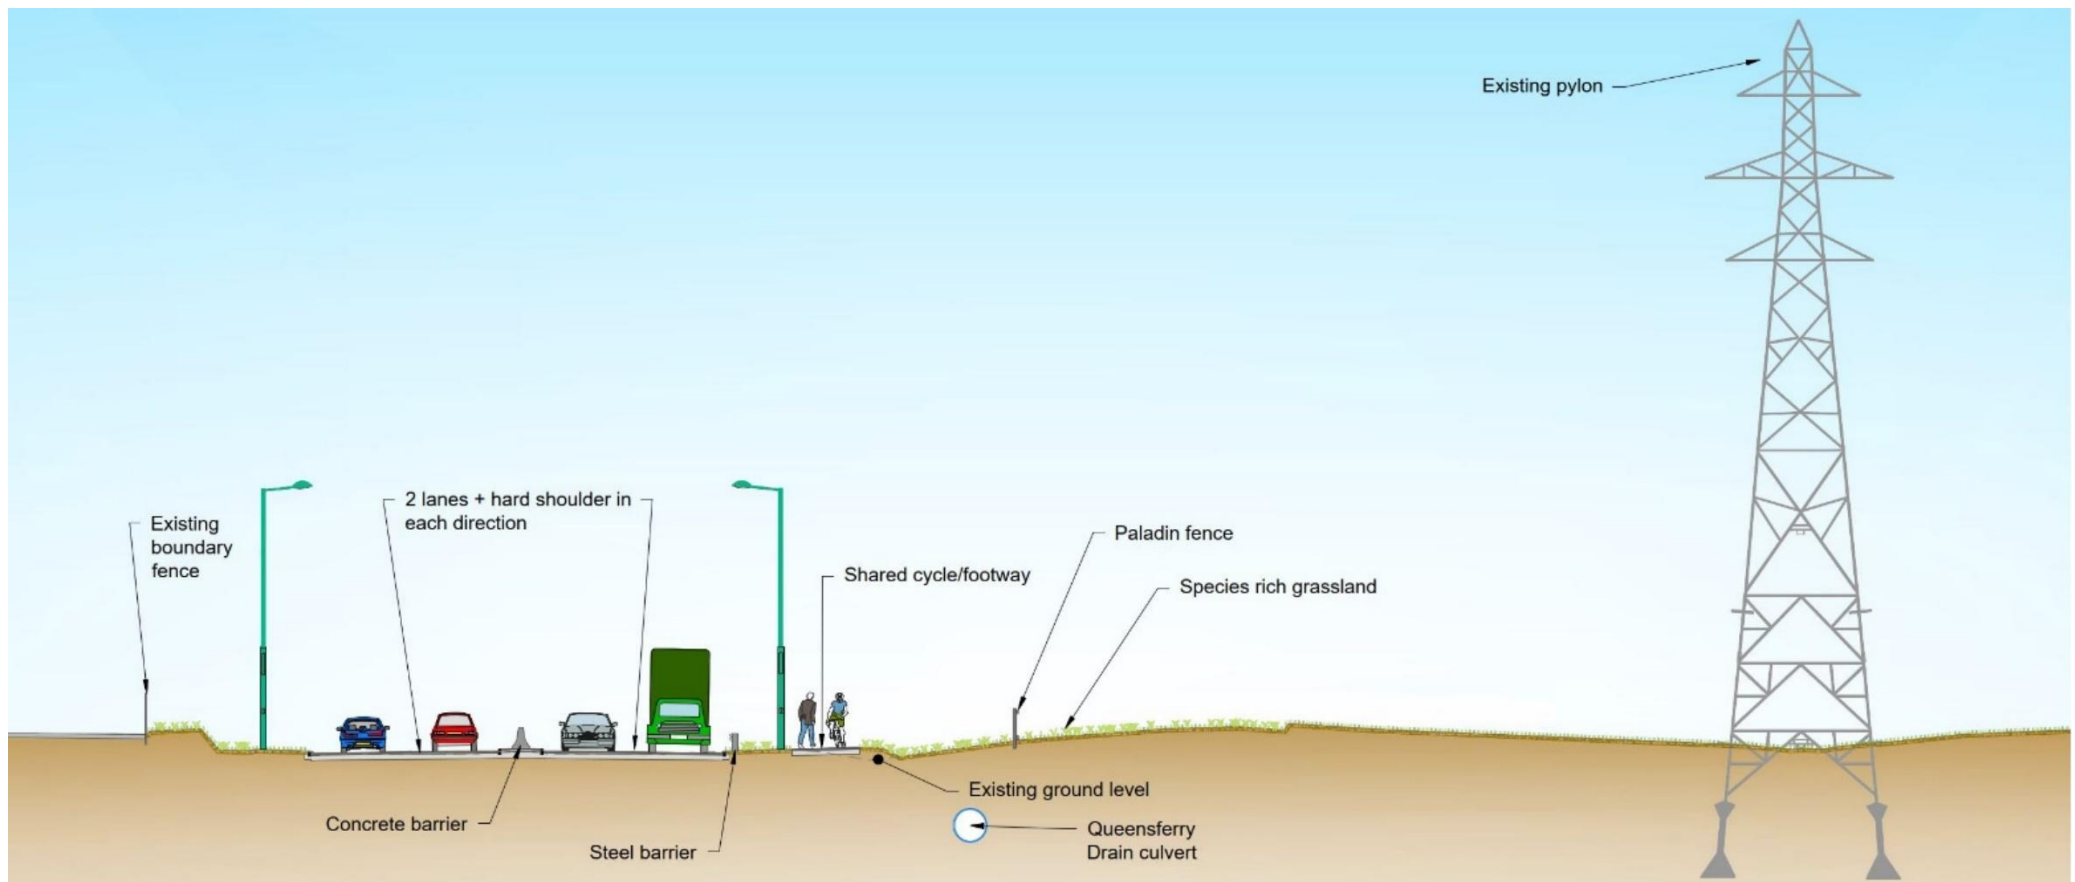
Typical cross section through the new highway adjacent the existing electricity pylon facing north east (Source: Mott MacDonald)
